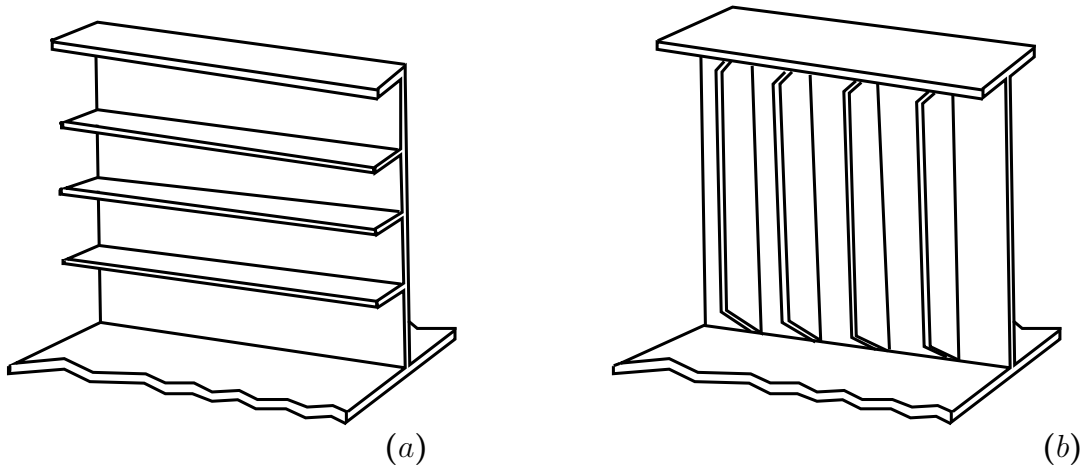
Typical stiffened girder examples with one free edge provided with (a) an eccentric stiffener and (b) a symmetric stiffener.
